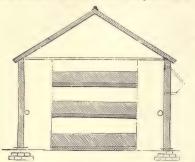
SECTION OF SPAN-ROOFED MUSHROOM HOUSE,
